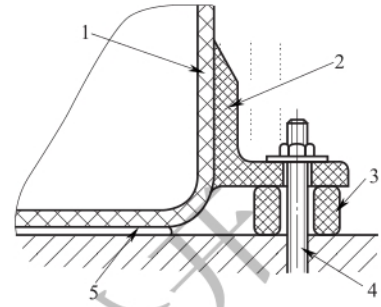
Schematic diagram of anchoring structure of flat bottom equipment
